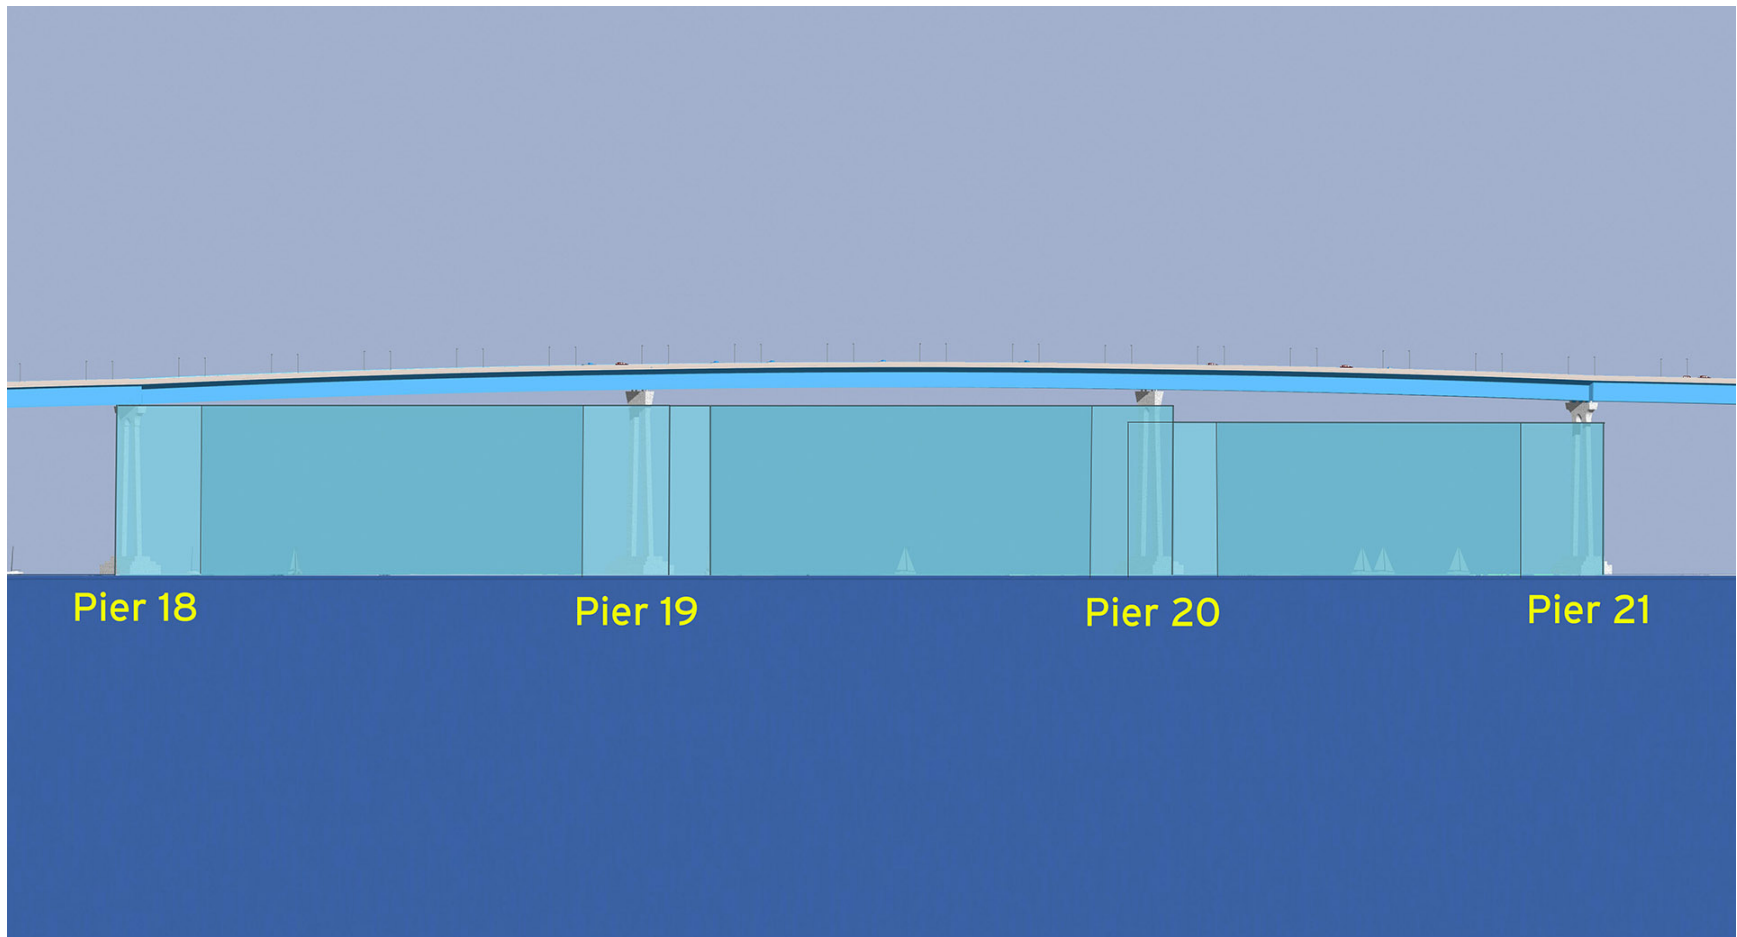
Navigation Channels between Piers 18 and 21 (looking north)
